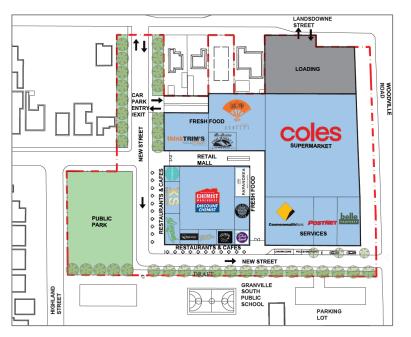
Site Structure and Land Use Plan – Draft Woodville Road Neighbourhood Centre DCP 2017, and Ground Floor Plan – Marchese Partners
